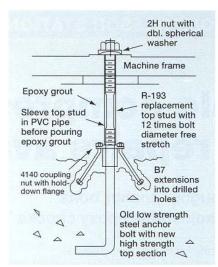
Anchor bolt repair involves chipping old grout and concrete out to a depth of 18 to 22 inches below compressor base.
